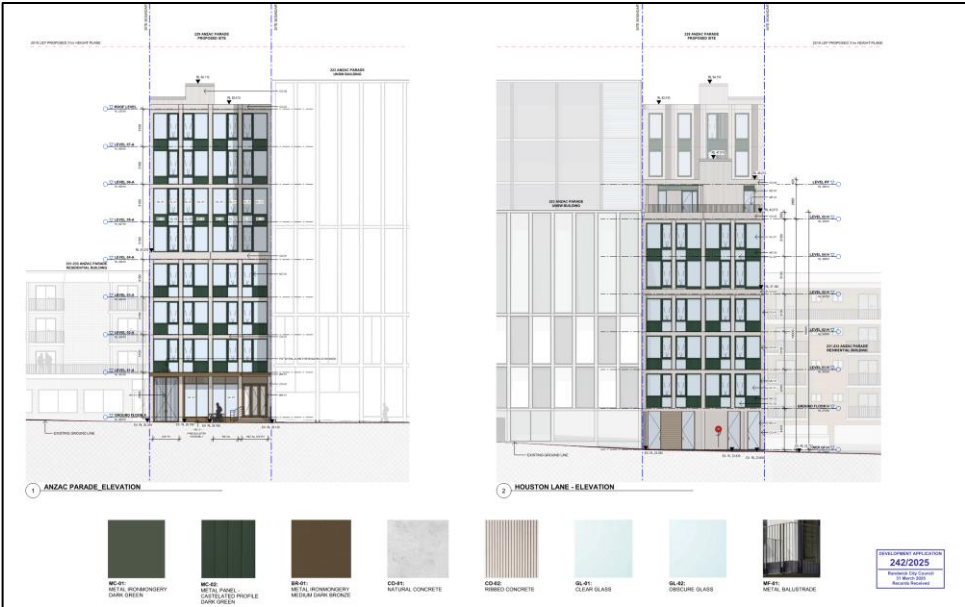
Anzac Parade (front) and Houston Lane (rear) Elevations (Source: Applicant)
